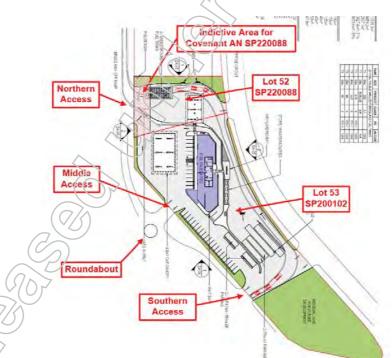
Labelling of internal access points relevant to EMT A RP903379
